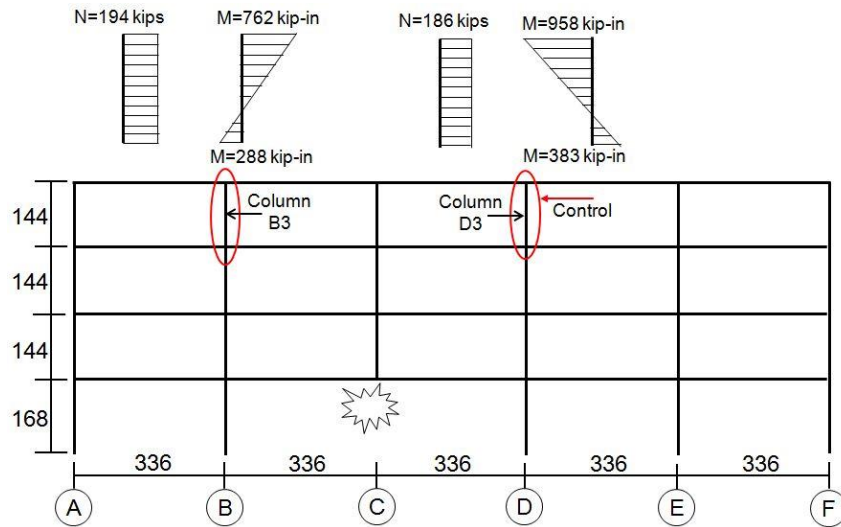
Moment and axial load of top floor columns next to Column C3 (unit of dimension: in.).
